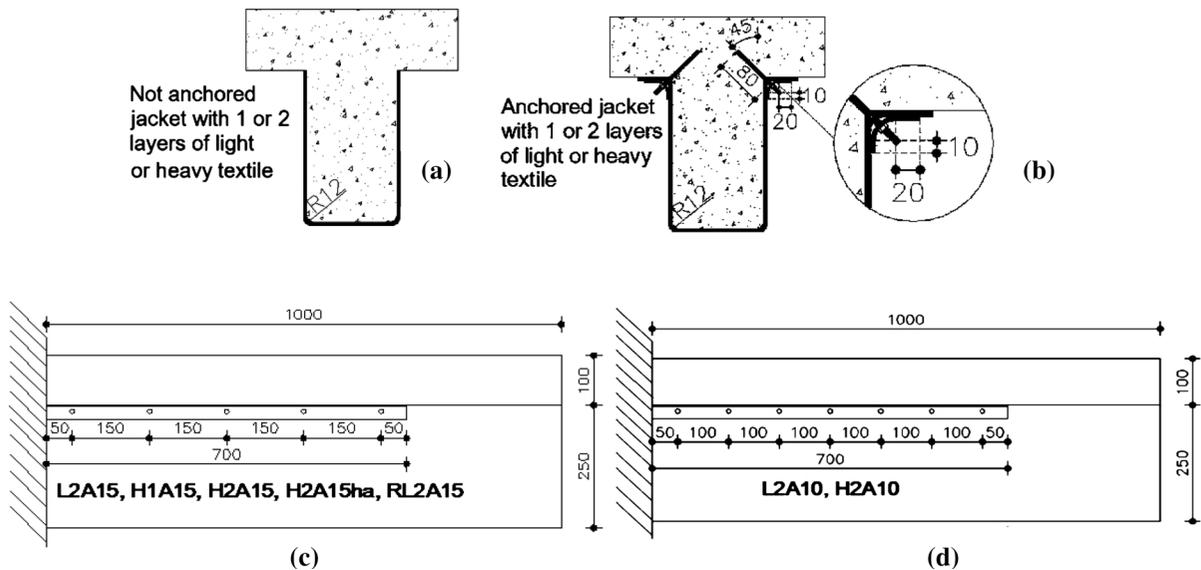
Strengthening configuration for the beams tested. a Cross section of strengthened beams without anchors; b cross section of strengthened beams with anchors; c side
